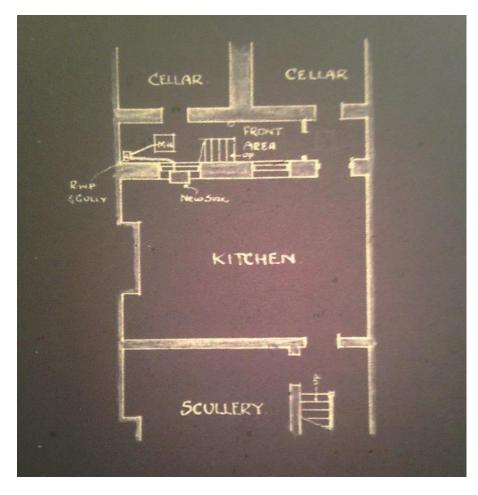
1925 drainage plan: lower ground floor¹³
